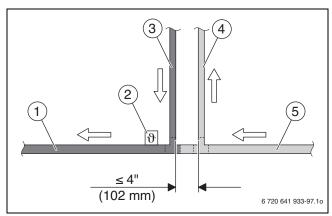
Mounting supply temperature sensor right next to boiler supply
